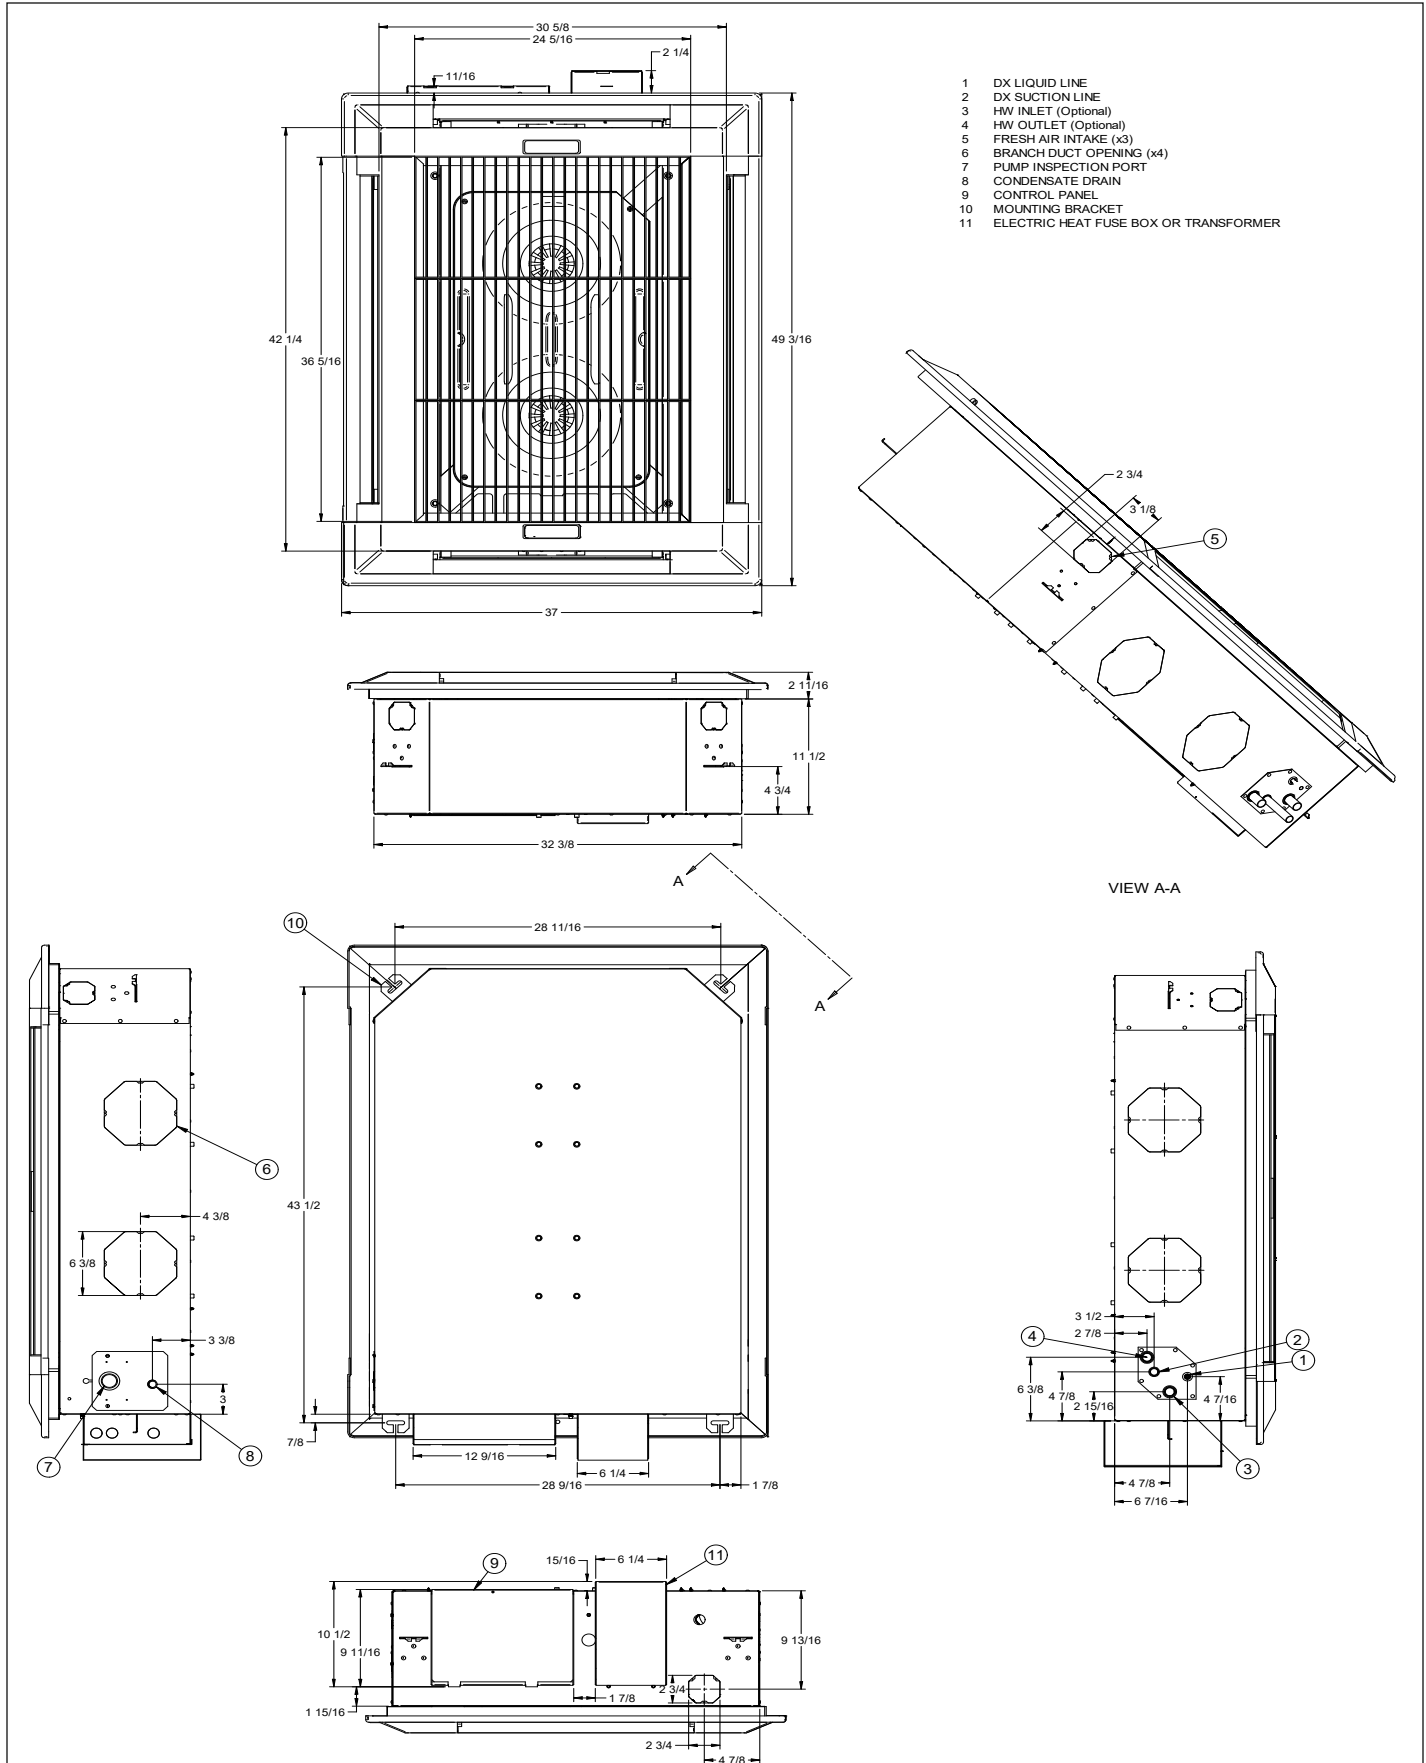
Technical Data – DX Cooling Only and Heat Pump Units
